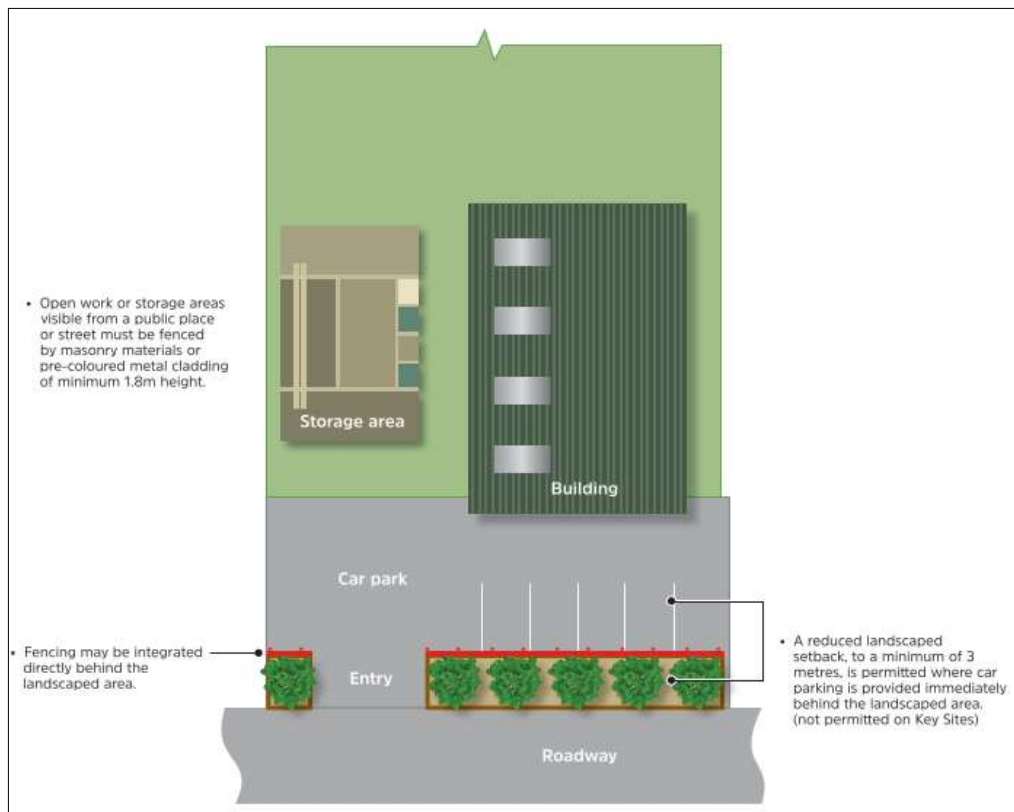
Typical Site Layout - All Sites other than Ring Road (Bandaar Drive) or Goddard Lane
